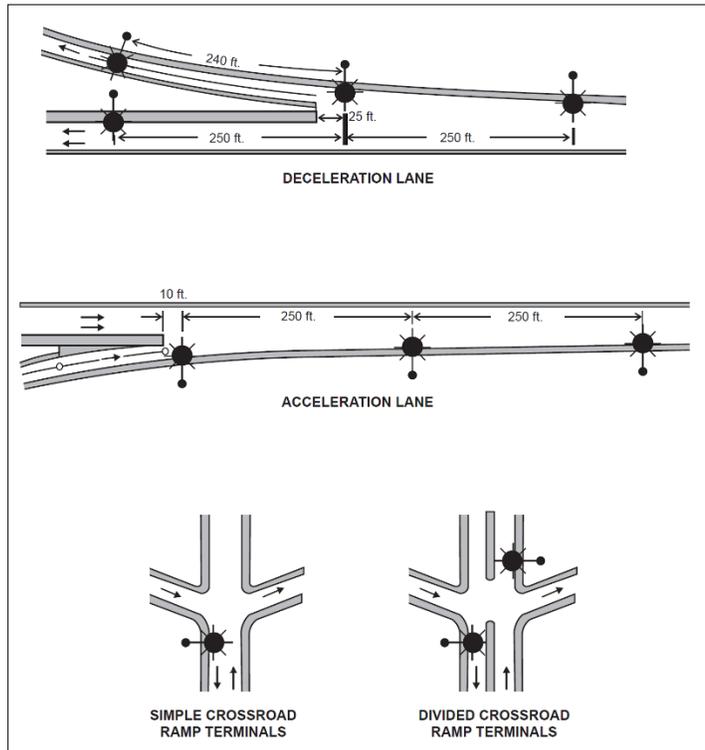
Typical Luminaire Locations Partial Interchange Lighting Davit Arm Poles (Assumes Luminaire Mounted at 40-Feet)
